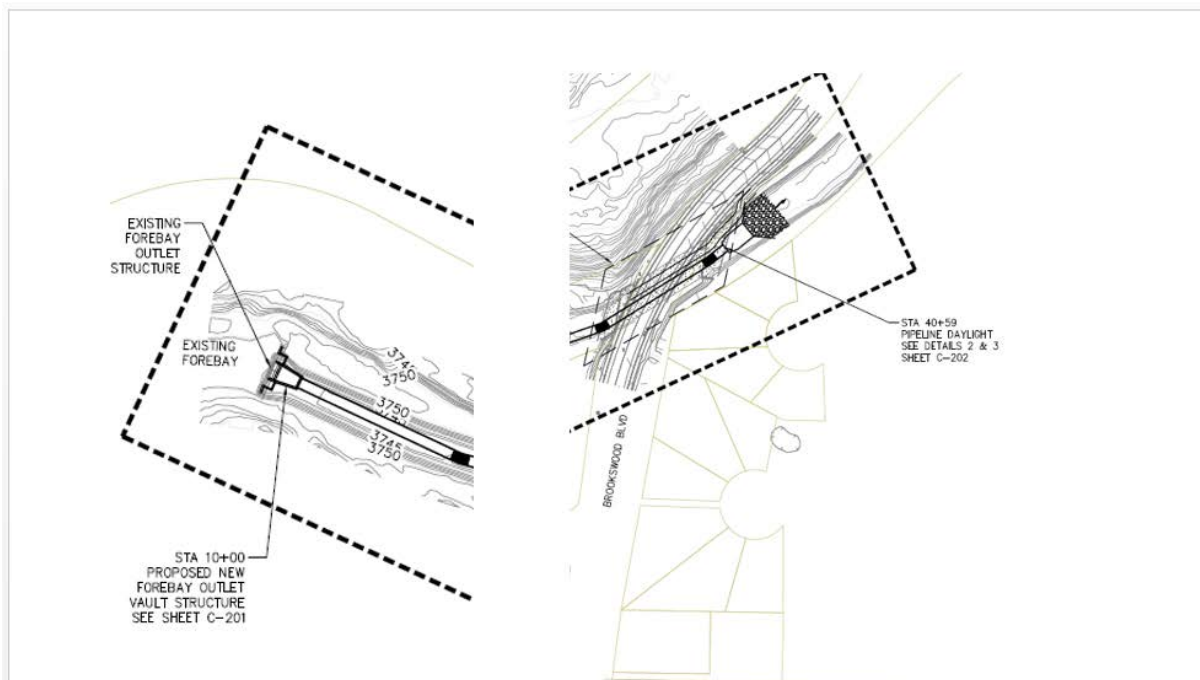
Detail of forebay and pipeline outlet preliminary design (COID 2016).
